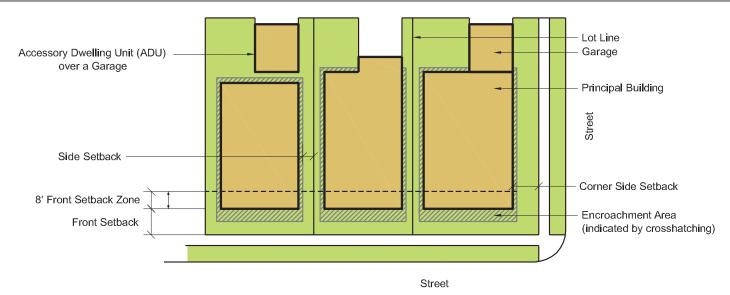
Typical lot diagram - The outline above illustrates the building envelope defined by the required setbacks. Buildings must be designed to fit within the envelope shown.
